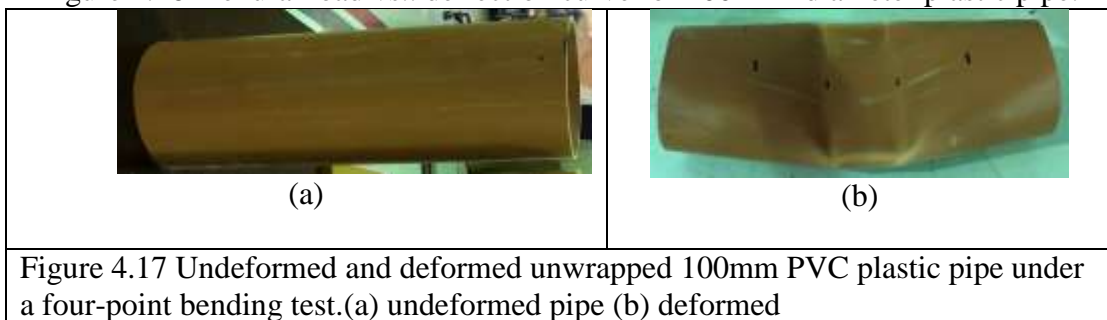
Undeformed and deformed unwrapped 100mm PVC plastic pipe under a four-point bending test.(a) undeformed pipe (b) deformed
